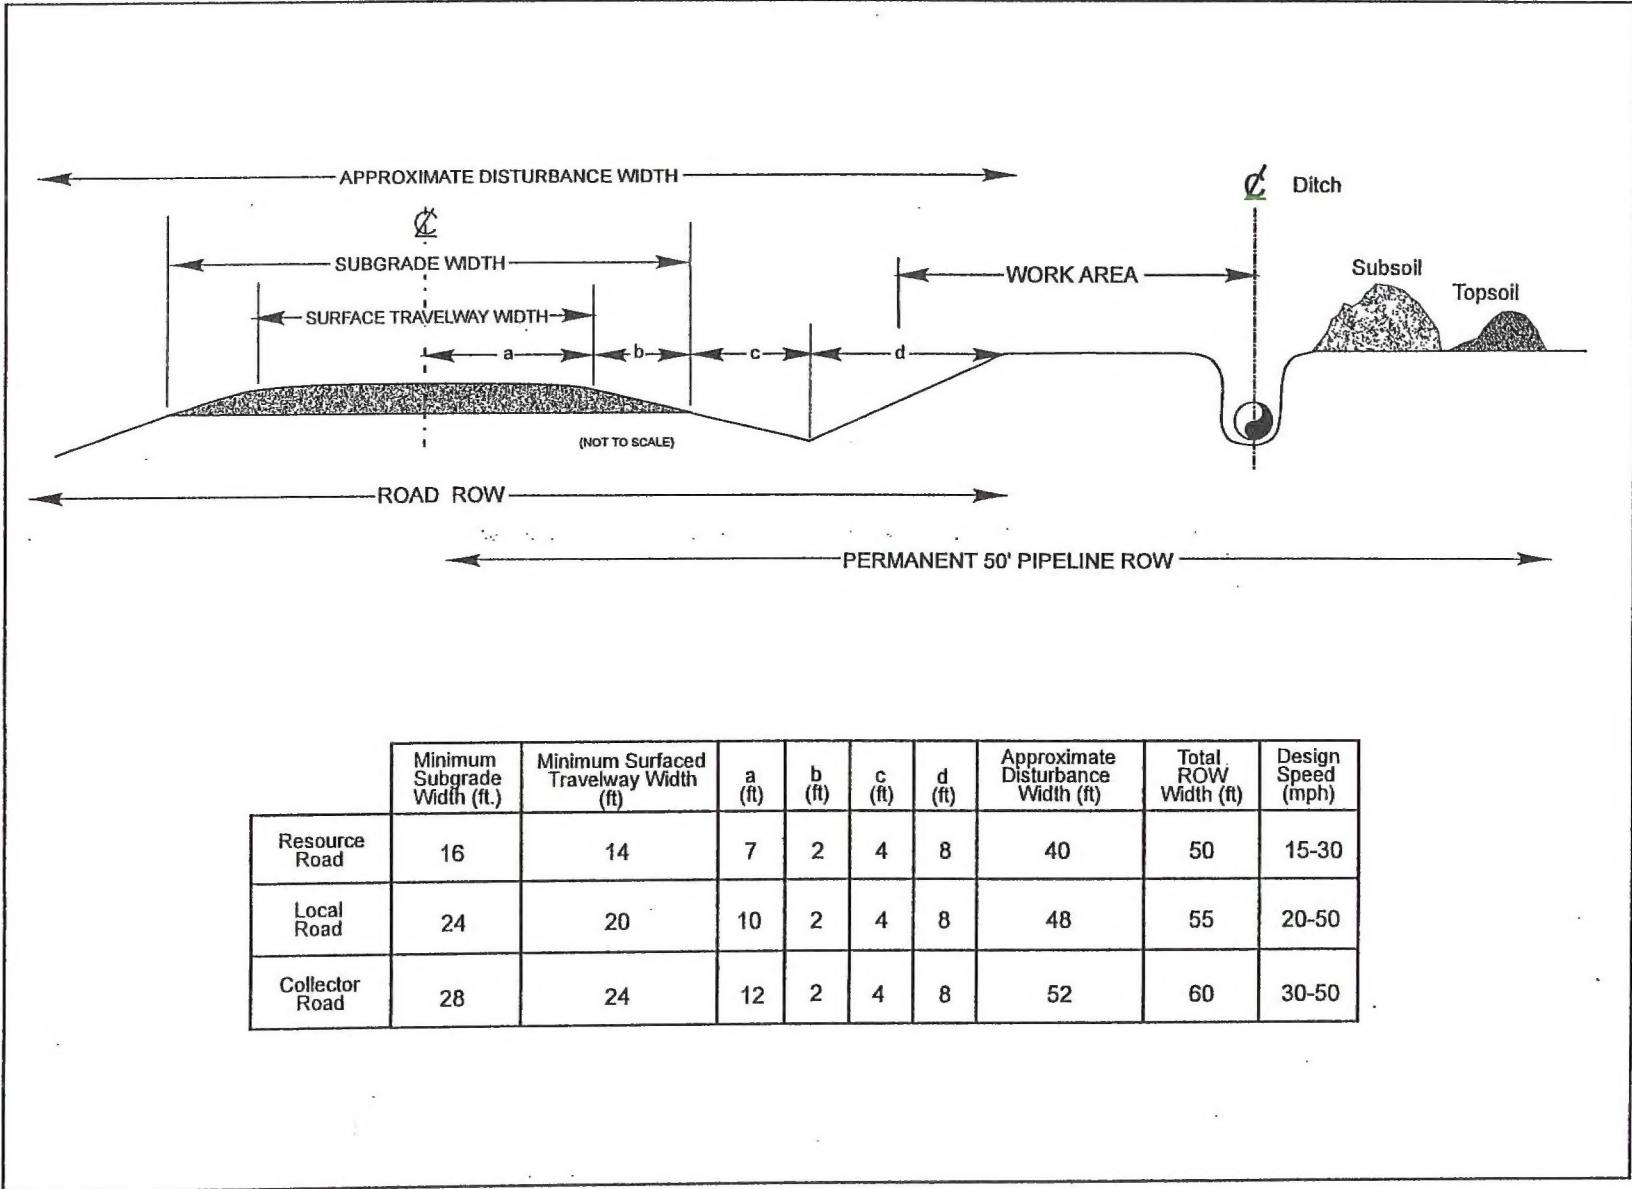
Typical Roadway Cross-section with Pipeline Installation Alongside the Road.
